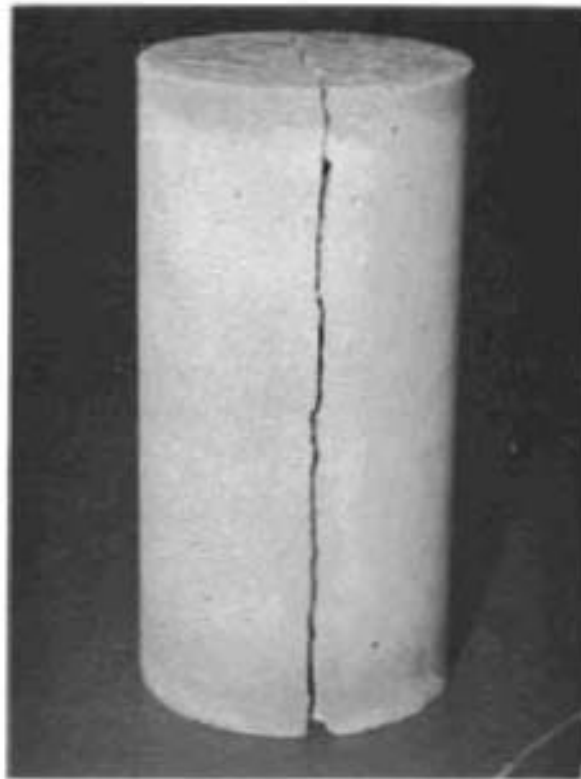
Concrete Indirect Tension Specimen After Failure
